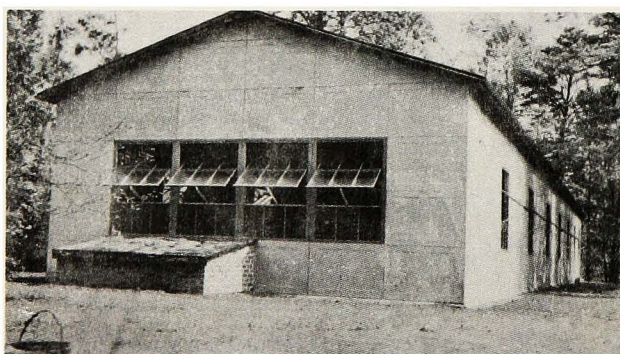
Another view of the building housing the BEB's 85-foot wave tank in Washington, D.C., shortly after completion. This initial building remained the central point around which offices and other facilities were later constructed. Compare, for example, Figures 17 and 20.
